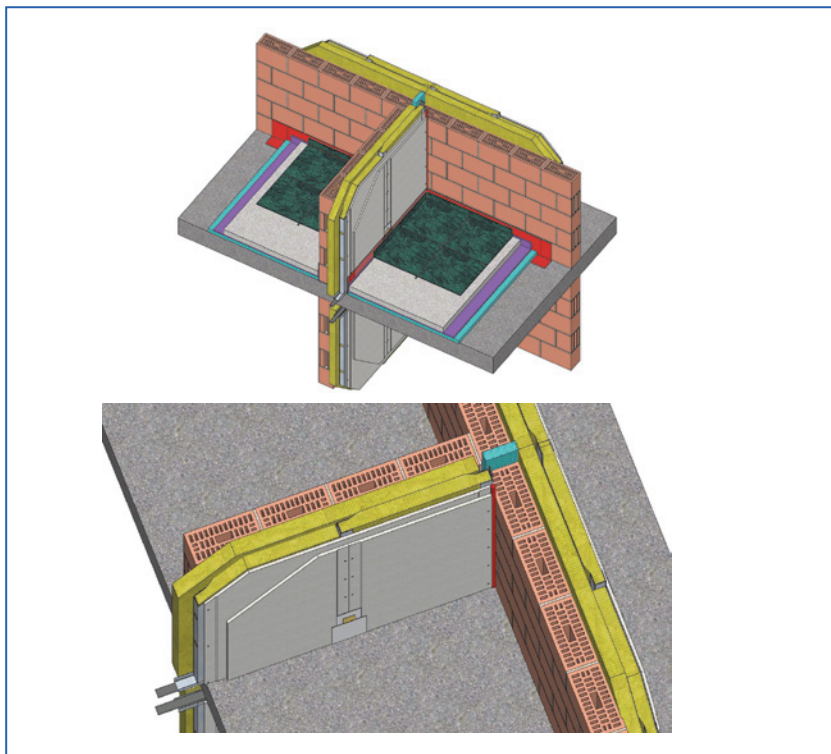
Drawings of general concept 6 with semi-heavy single load bearing wall.
